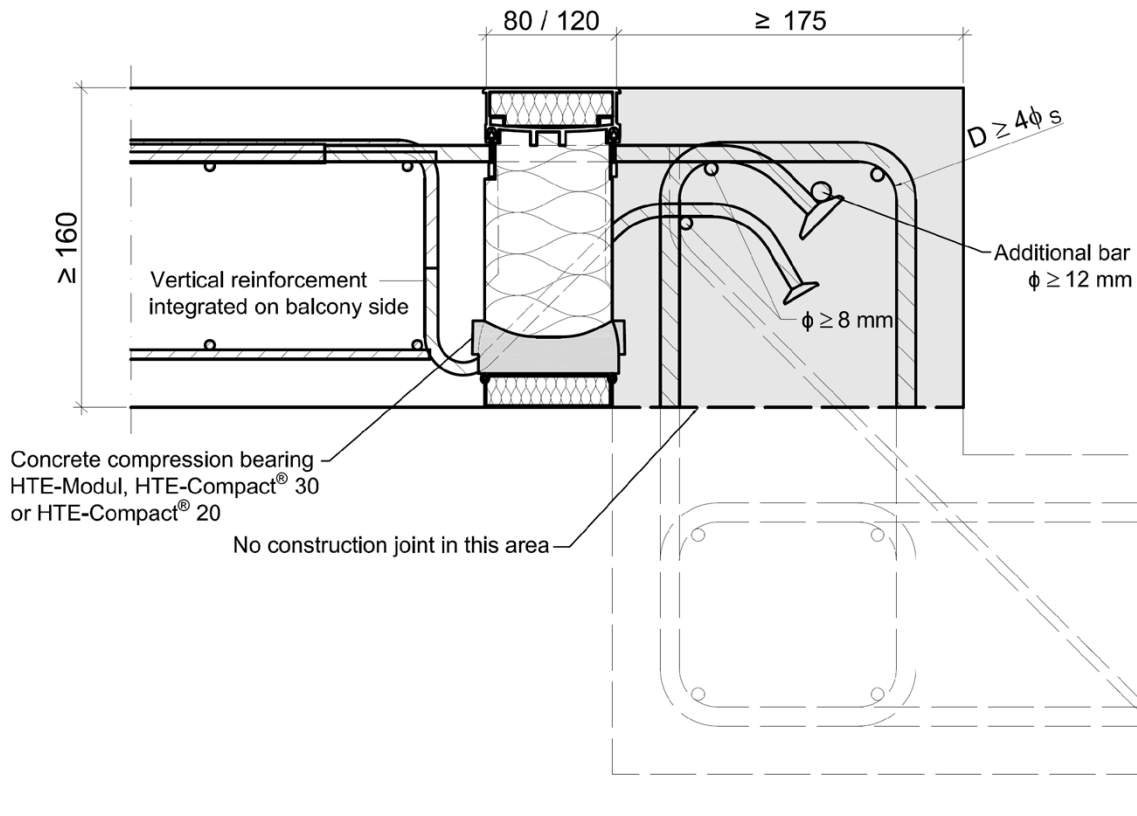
Example of Schöck Isokorb<sup>®</sup> Type K-O with CCE in installed condition with connection to wall or height offset
